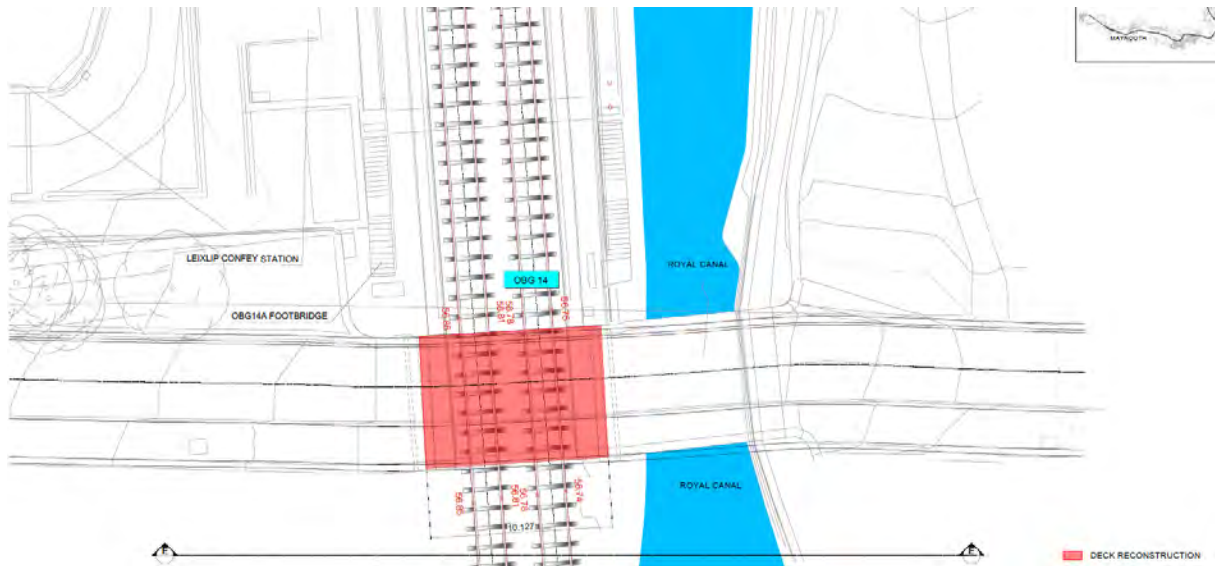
Deck reconstruction of OBG14 - Plan view
